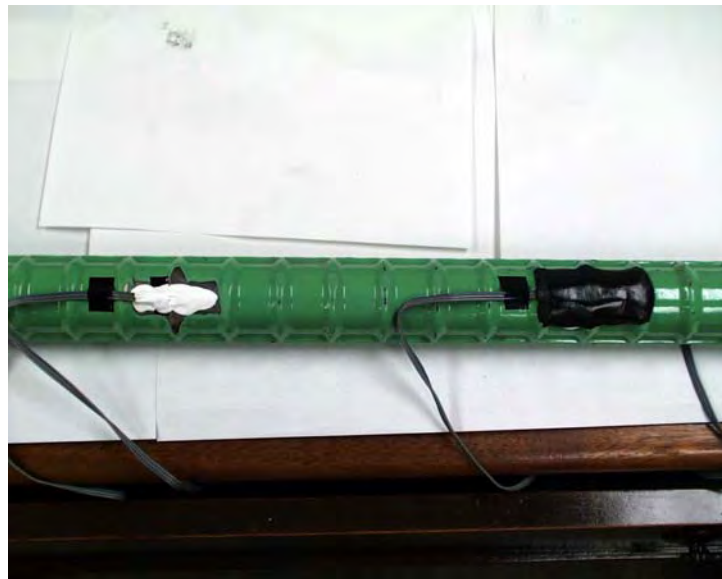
Layers of Waterproofing Protection on Gage Installations Bonded to Metal Surfaces
